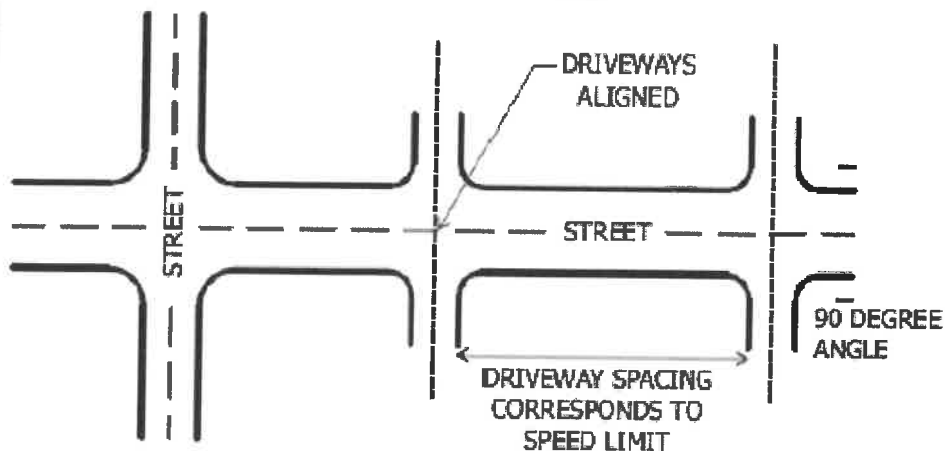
E: Illustration of minimum driveway spacing requirements.
